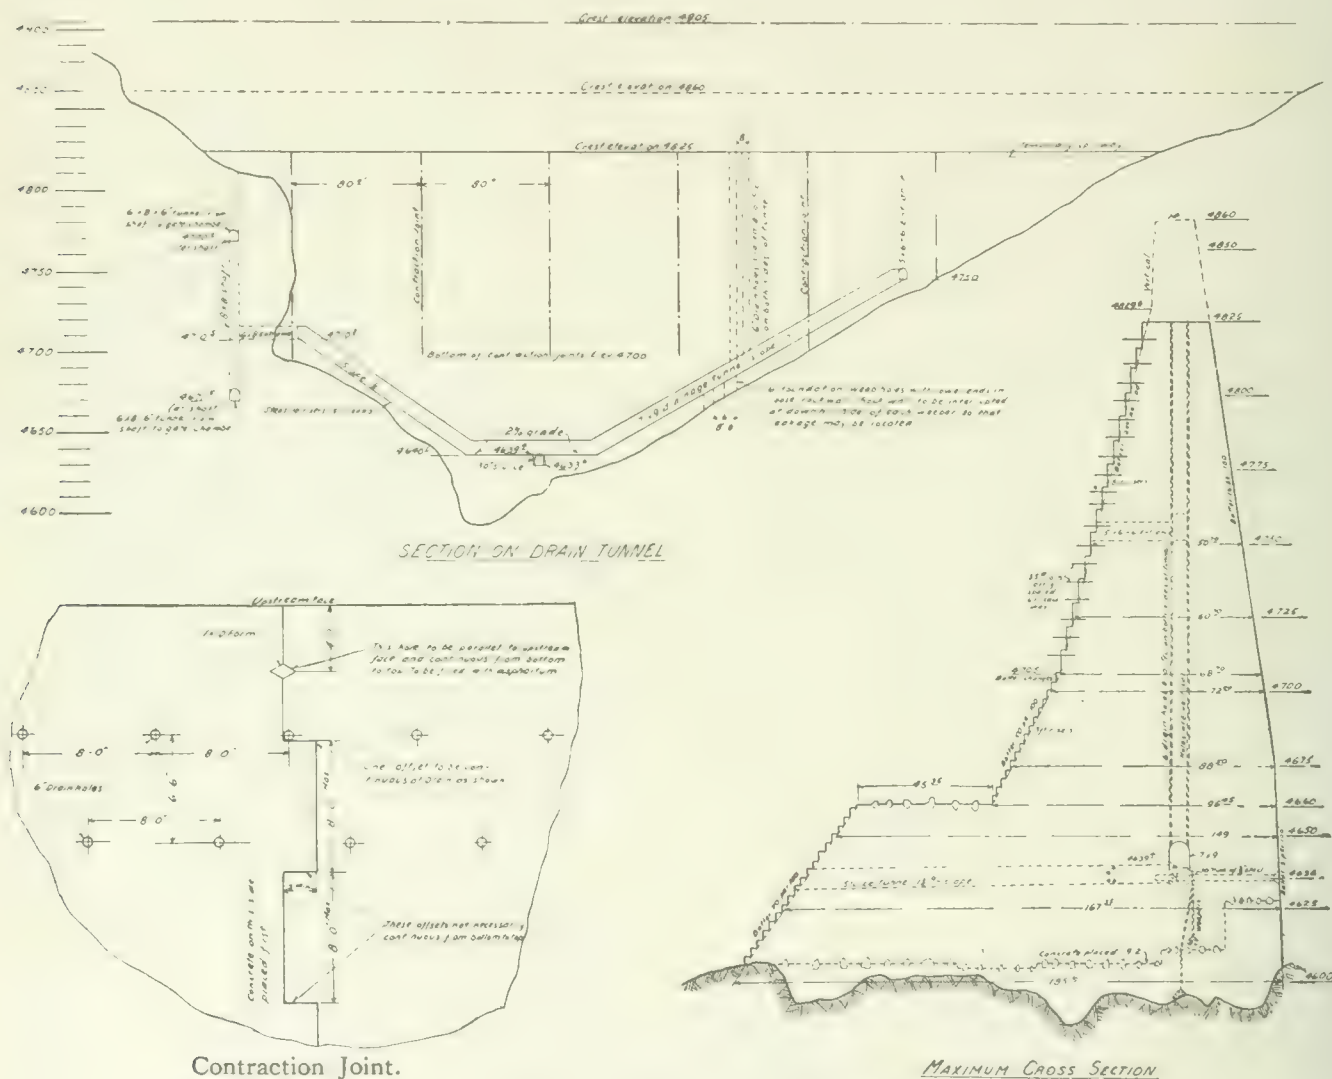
Sections of 225-foot Lake Spaulding Dam.
